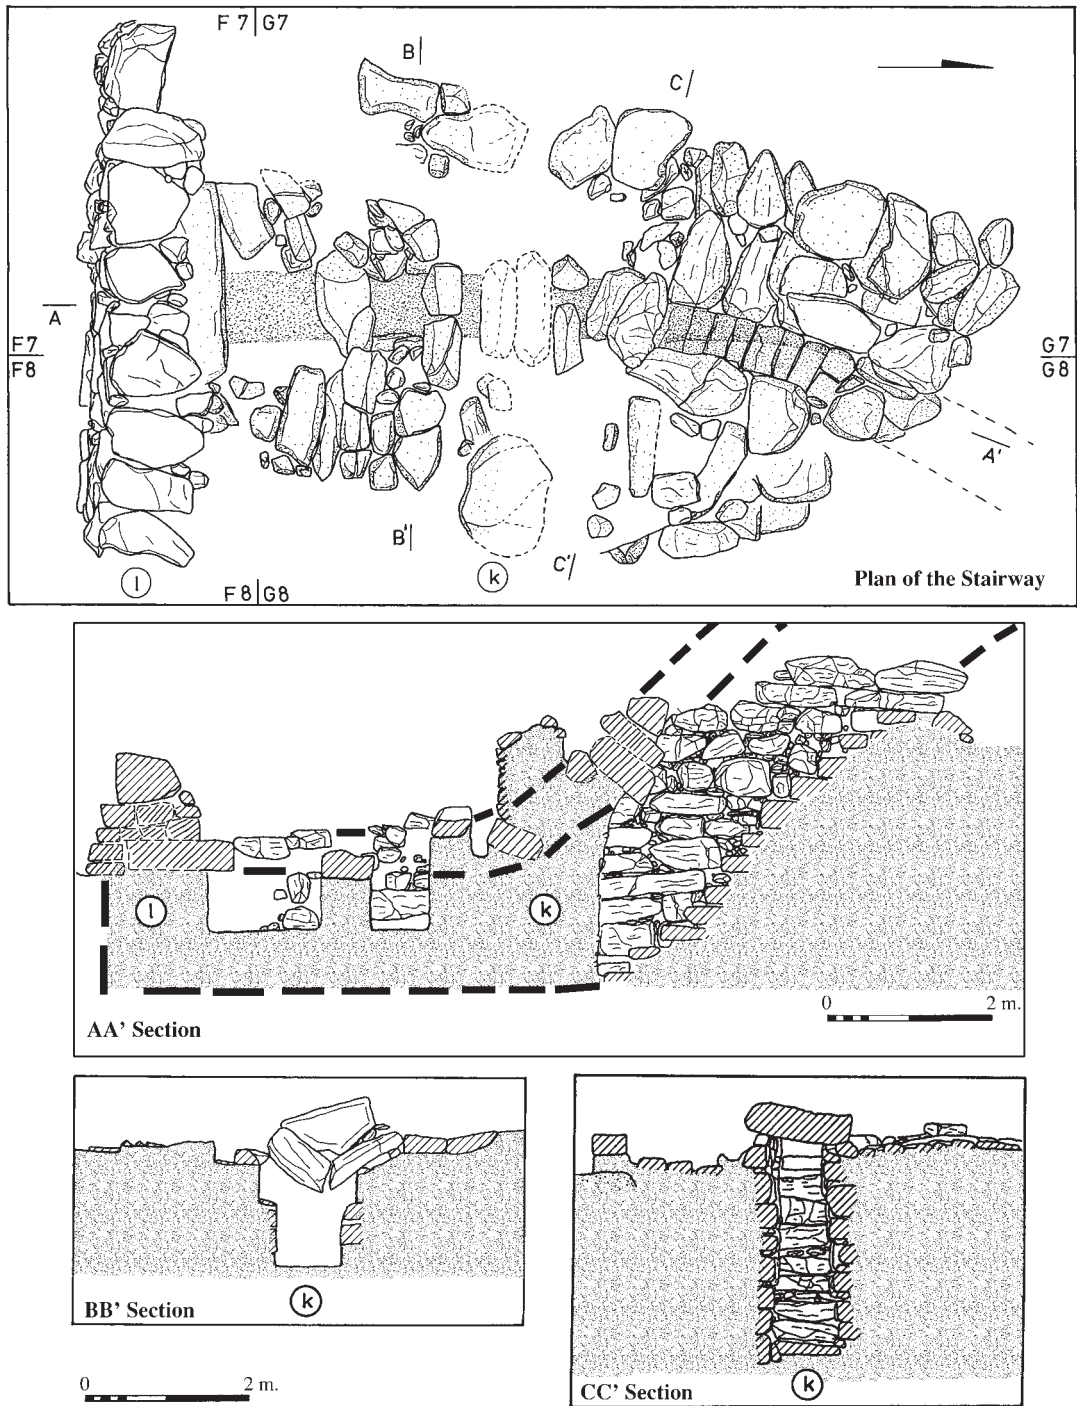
Plan and Sections of the Tunnel with Stairs.
